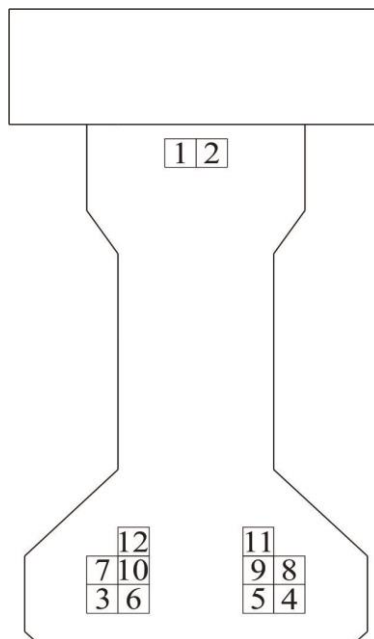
Prestressing strand jacking sequence for SS precast beams
